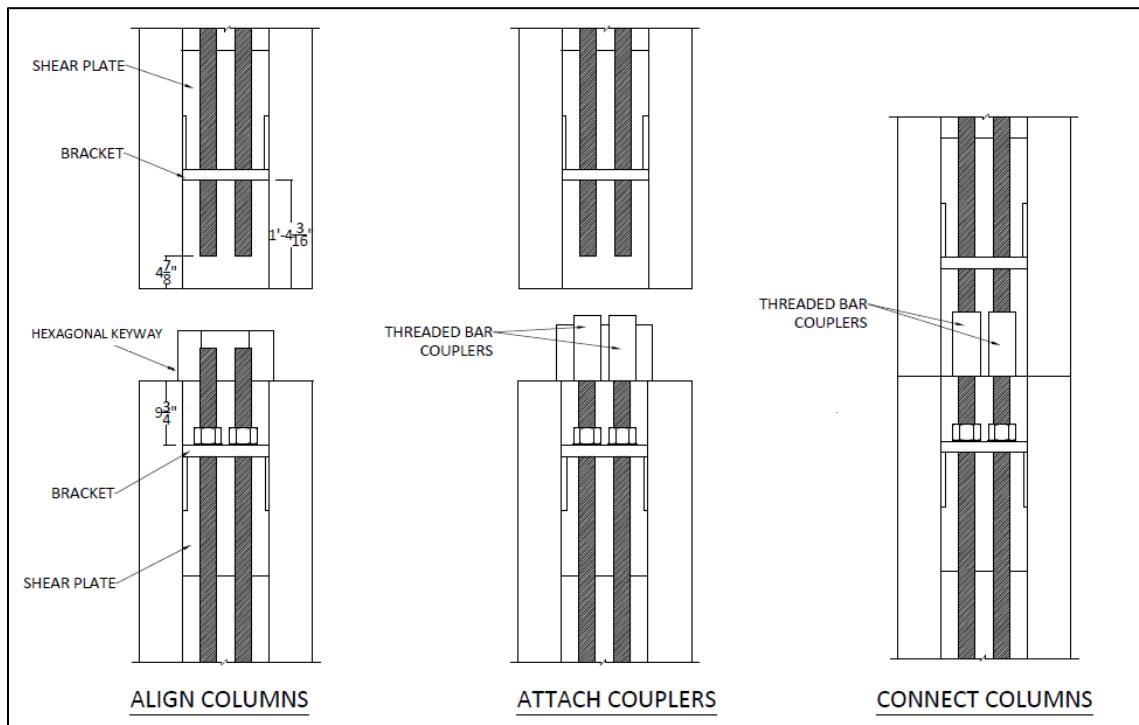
Quick connection between Hexcrete sections at columns utilizing threaded bars
